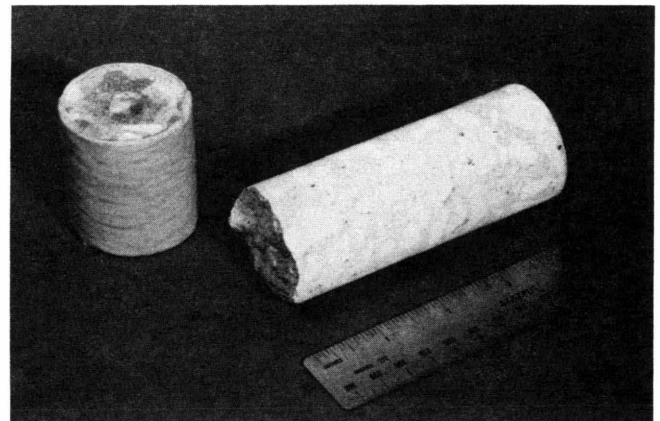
Field concrete core (right) and prepared specimen (left).
